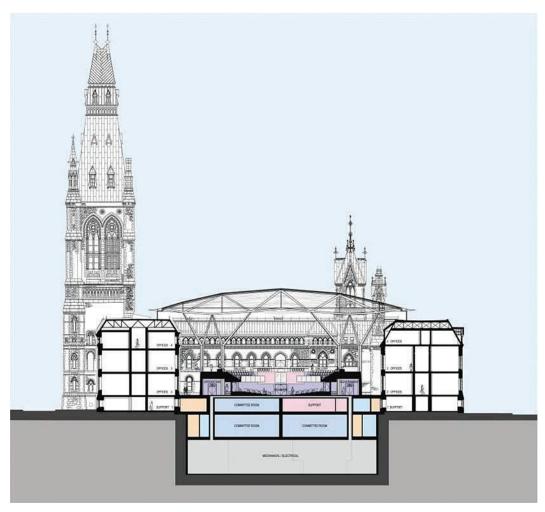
An artist's rendering of a cross-sectional view of the redesigned West Block building, including the House of Commons Chamber
